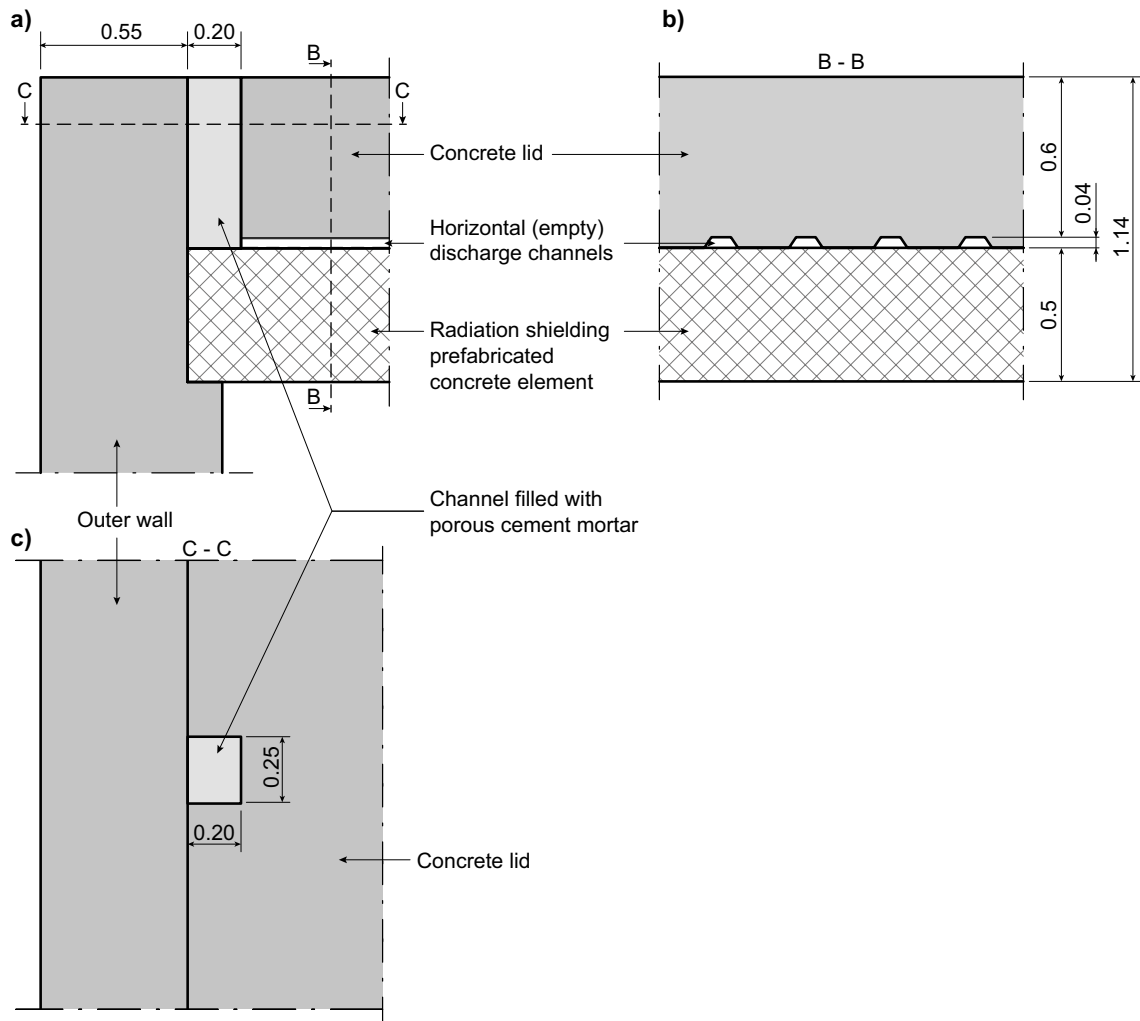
Schematic illustration of the planned gas venting system in 2BMA (units in m). a) Cross section of the whole system. b) Cross section showing horizontal (empty) discharge channels. c) Vertical discharge channels filled with porous cement mortar, seen from above.
